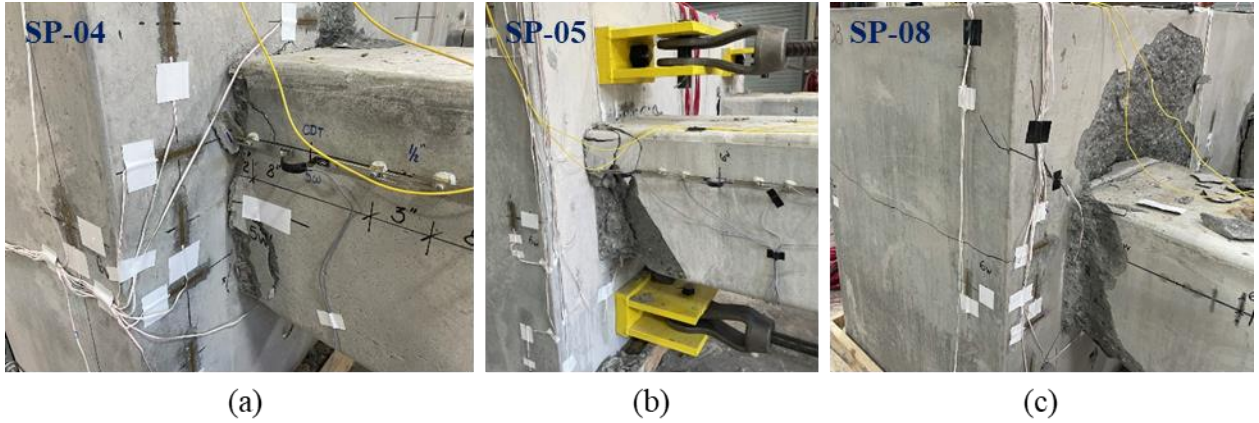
Examples of spalling of concrete on compression face of pile for (a) SP-04, (b) SP-05, and SP-08 during failure
